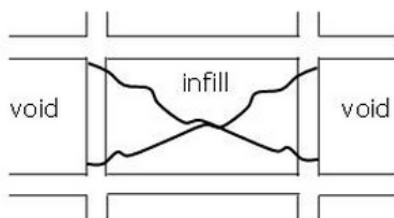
Failure of Column due to Interaction with Infill Wall
